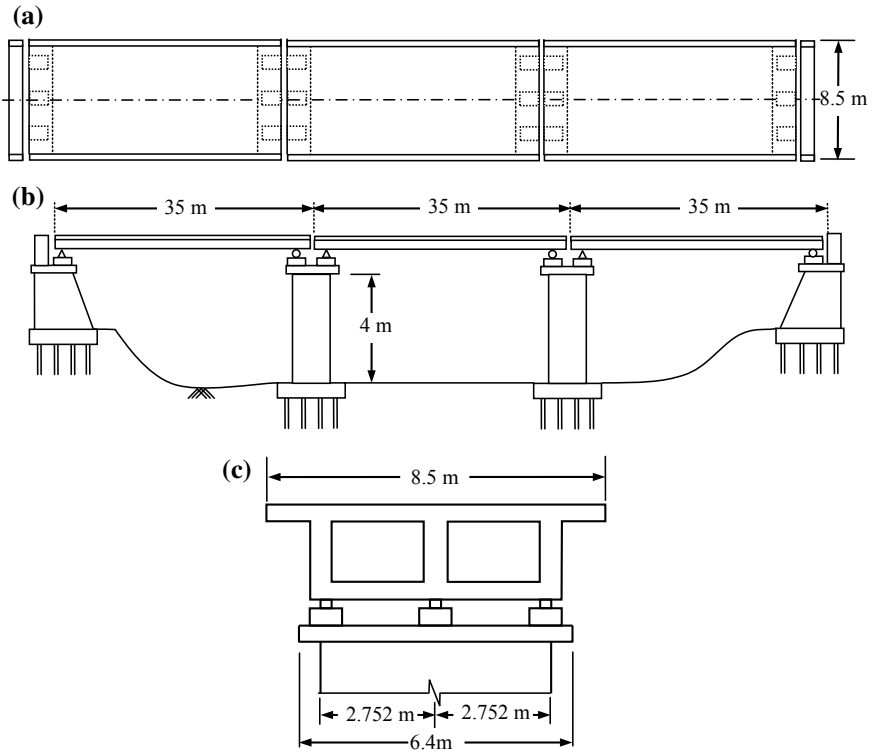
Details of bridge: a plan, b elevation, c box girder
